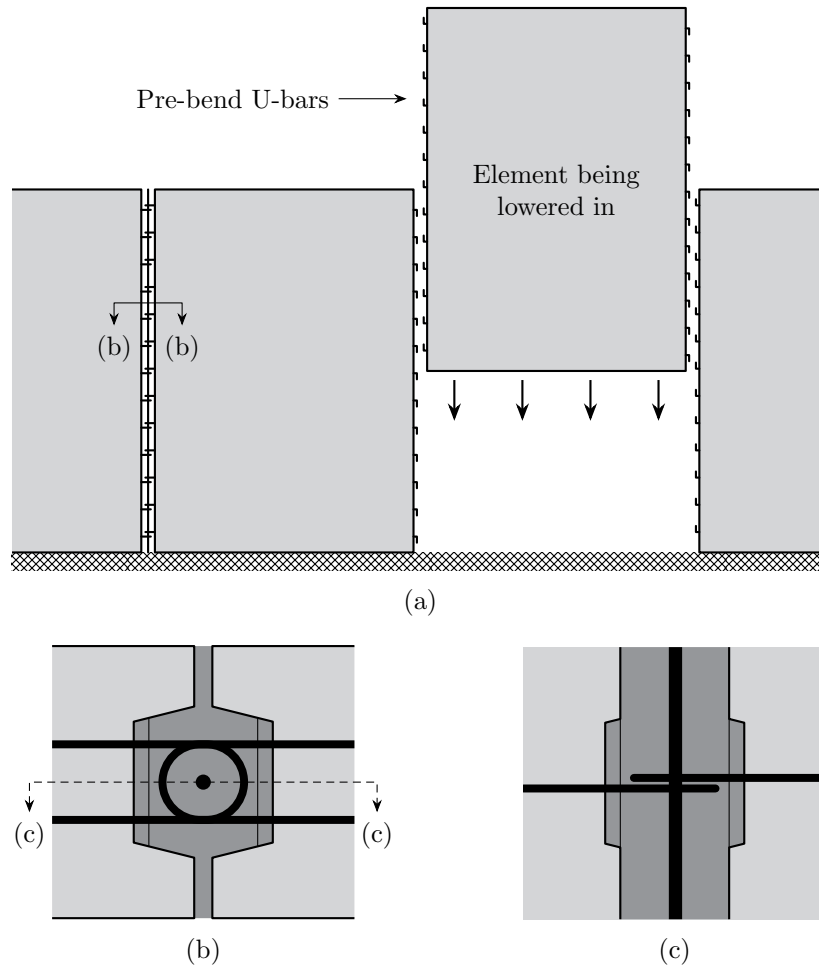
a) Assembly of the precast panels on the construction site, b) horizontal cross section, and c) vertical cross section of a panel-to-panel joint (adapted from Sørensen et al., 2016)
